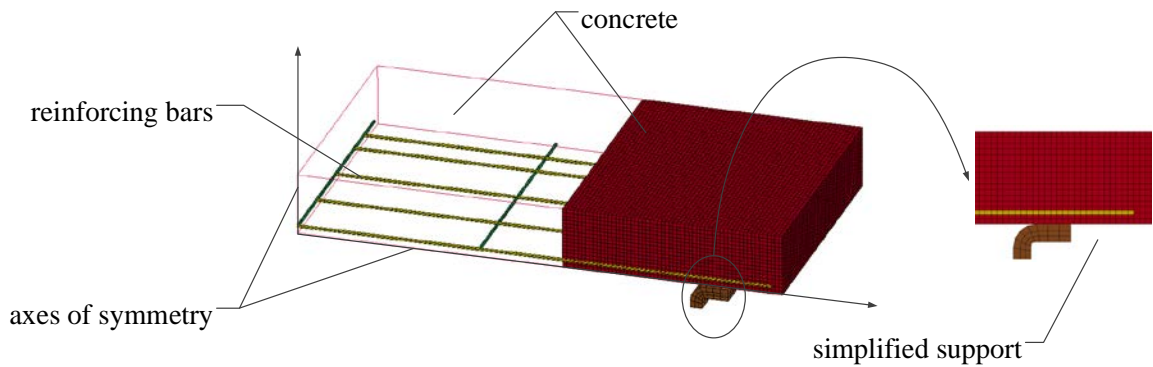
Layout of the $\frac{1}{4}$ FE model for the slab and the end support beam
